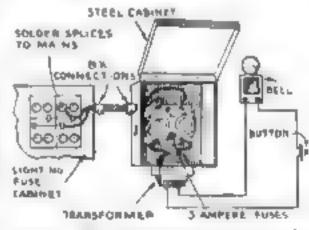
, Bell transformer built into a steel cabinet with a proper y losed cut-out block.
